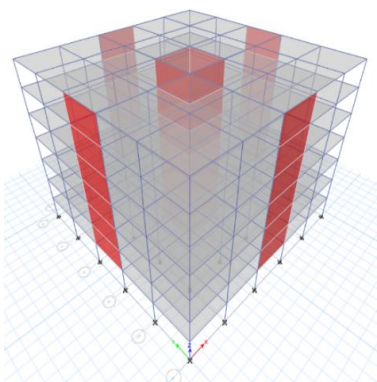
Model 13 - core shear wall at center with wall at periphery in two directions
